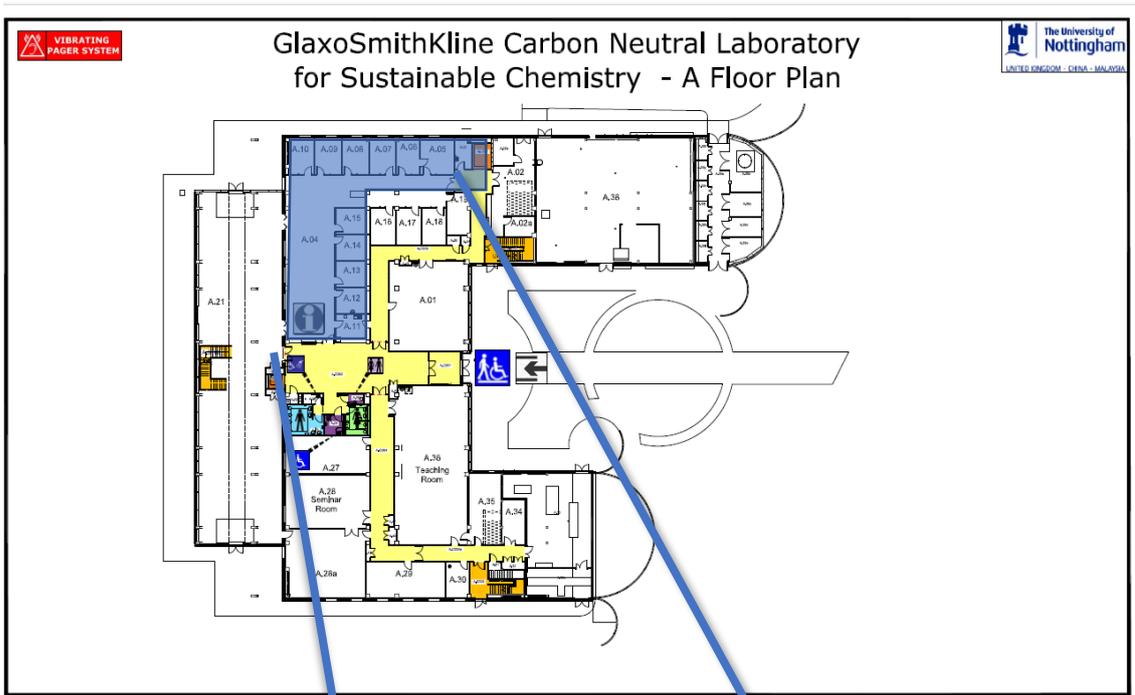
GSK Carbon Neutral Building Ground Floor Plane
